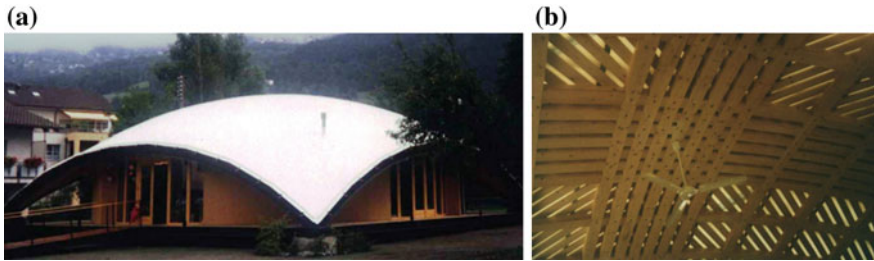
Kindergarten's building in Lausanne roofed with a shell from planks, a view of the building, photograph by the author, b view of the plank shell from the inside, photograph by the author
